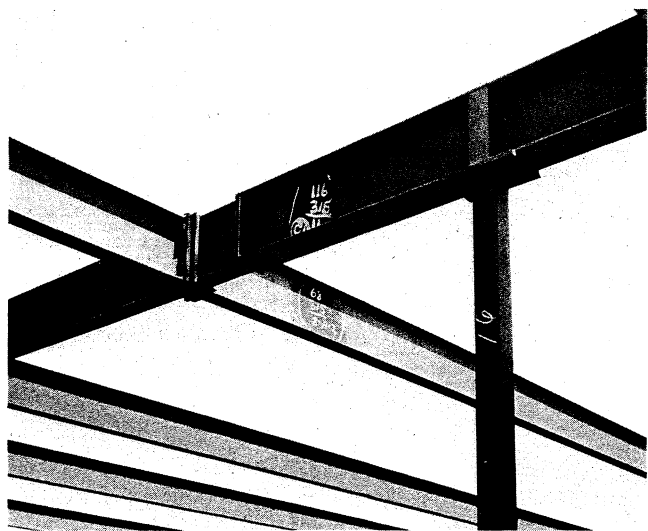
Continuous girder splice and beam moment connections, Harriet Beecher Stowe School
